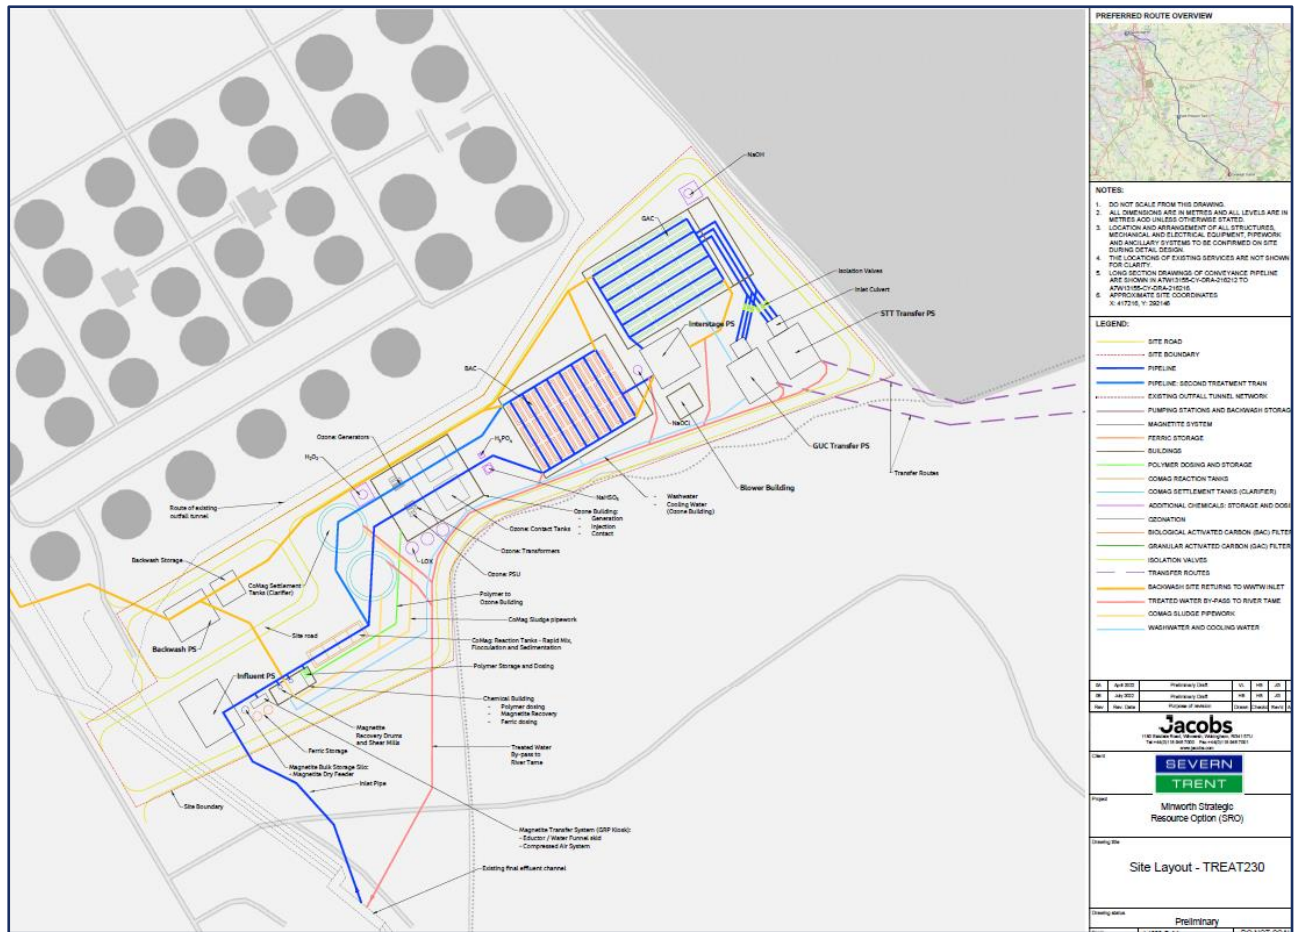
Preliminary Site Layout, Minworth Strategic Resource Option, Jacobs.
